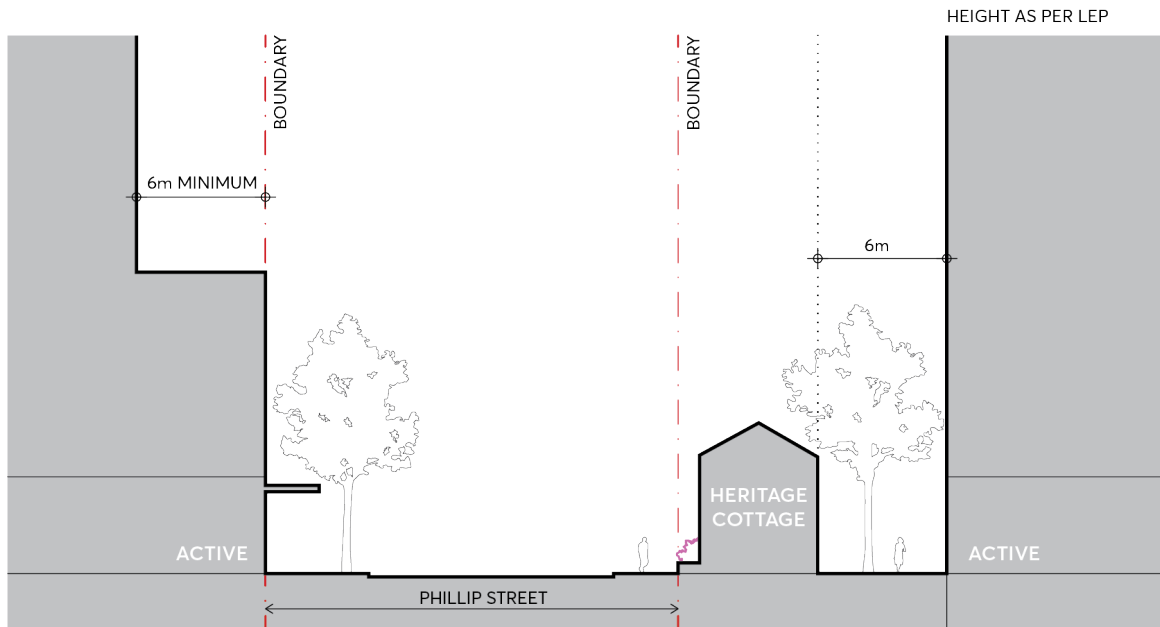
City East Block Phillip Street at 66 Phillip Street (Section C)
